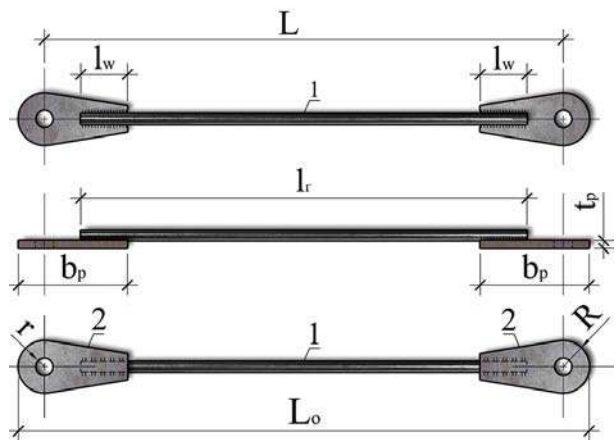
Modular elements of the bottom chord of steel and concrete composite cable space frames:
